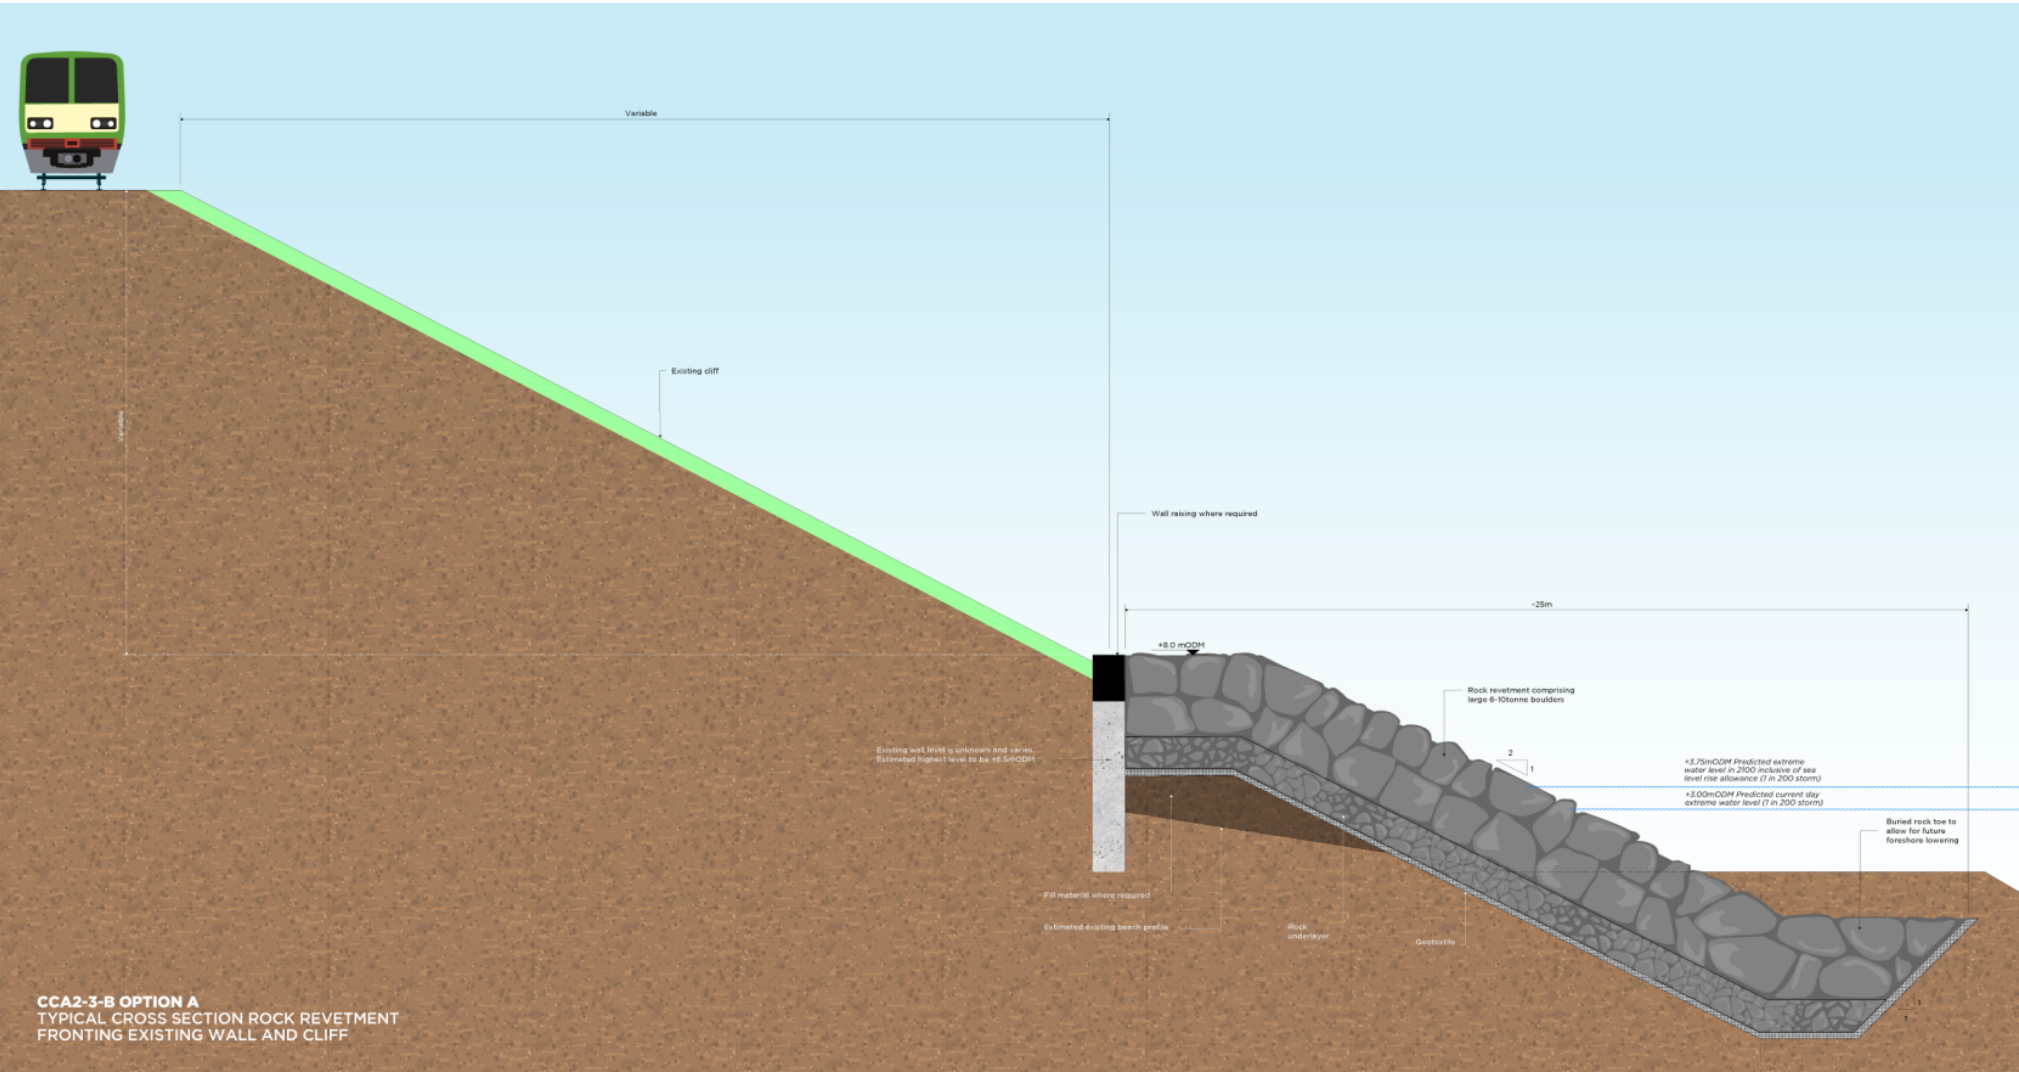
CCA2/3-B Option A Typical Cross Section
